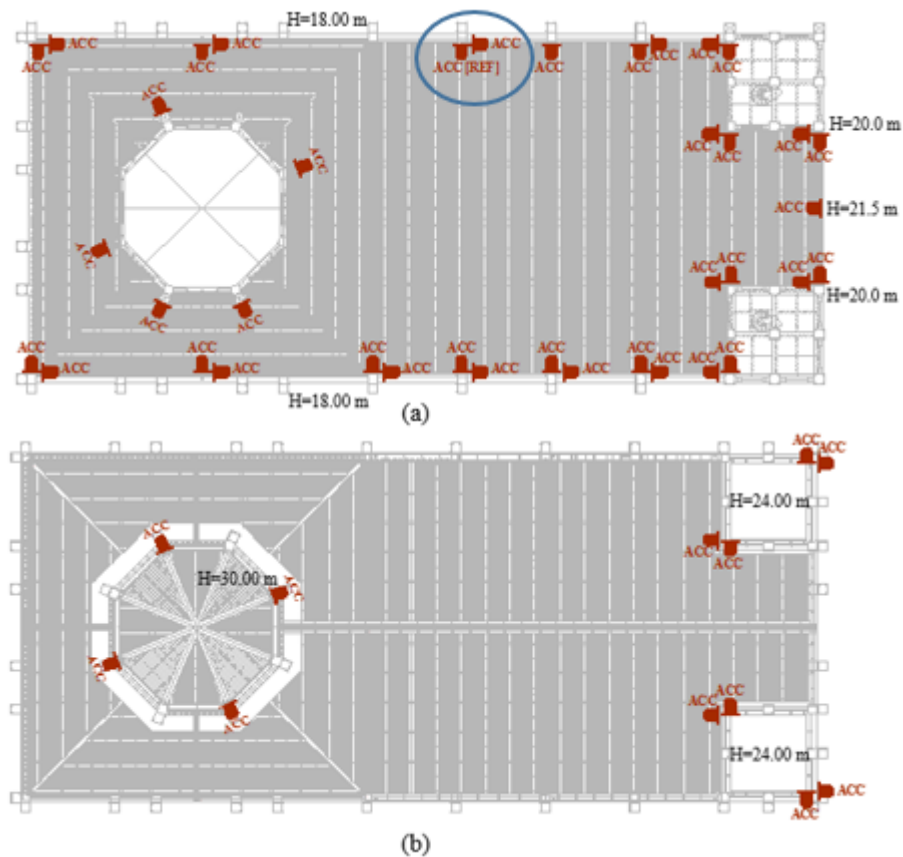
Accelerometer setup: (a) Plan at roof level; (b) Plan at dome level.
